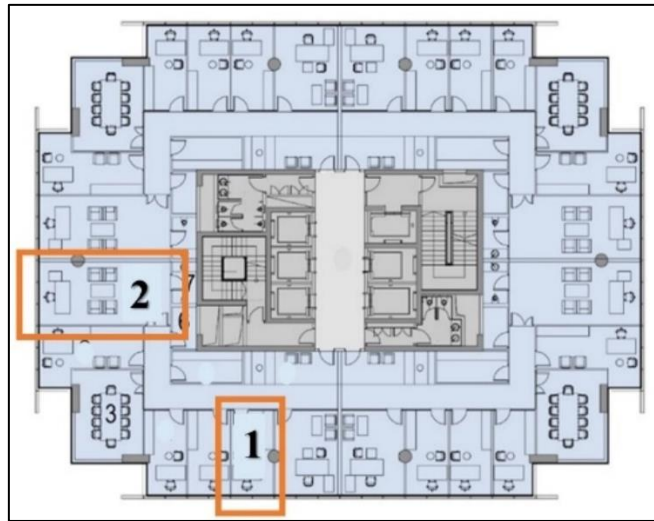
The plan of 15th floor of A block (official building) of TEPE PRIME [53] and the location of 1st and 2nd samples
